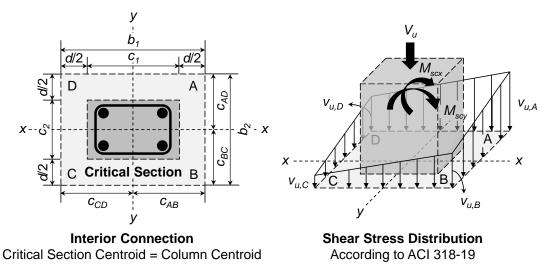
Shear stress distribution at slab-column connection (ACI 318-19)
